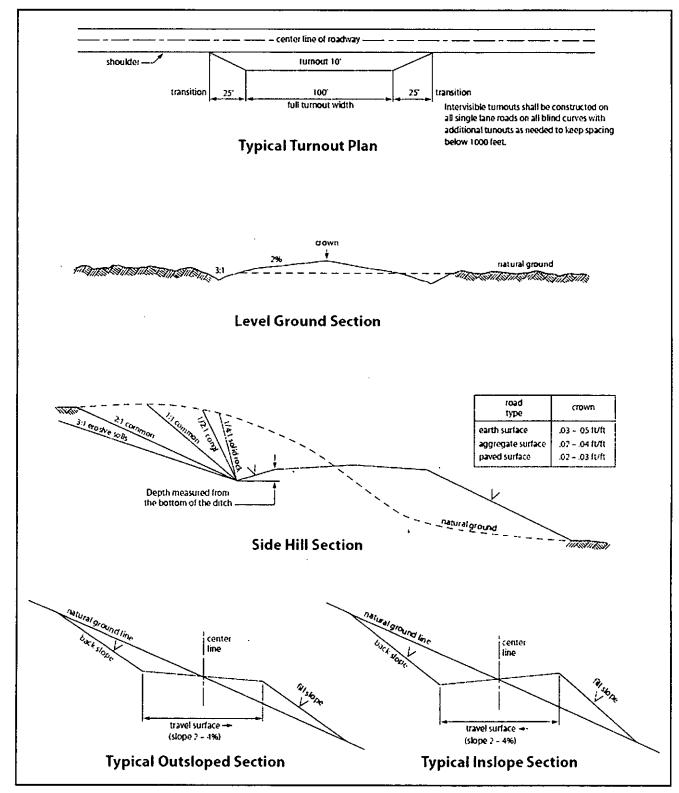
Cross-sections and plans for typical road sections representative of BLM resource or FS local and higher-class roads.
